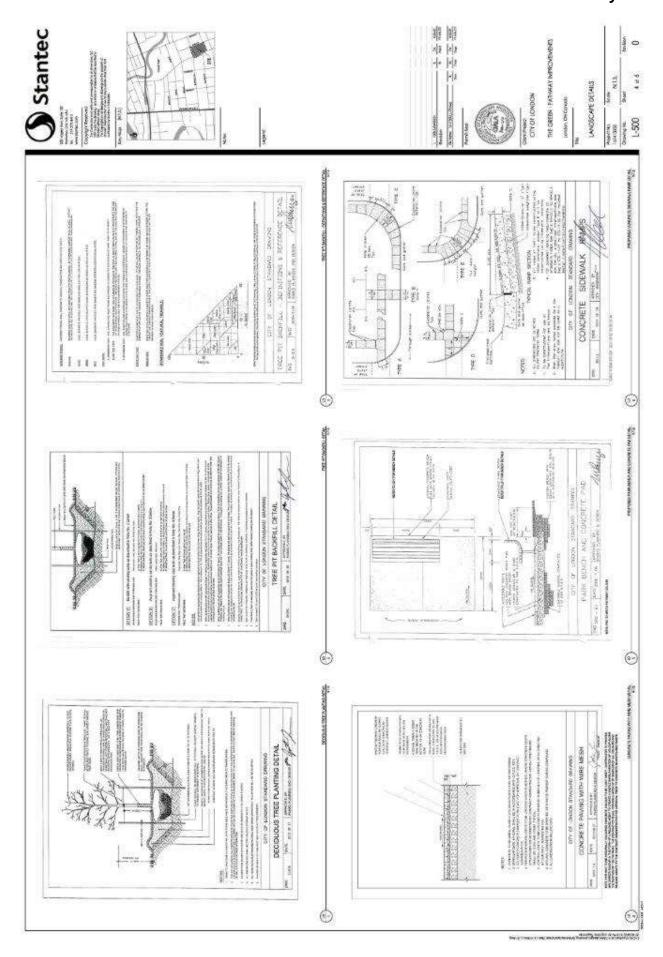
Drawing L-500: Landscape Details (April 2, 2018).
